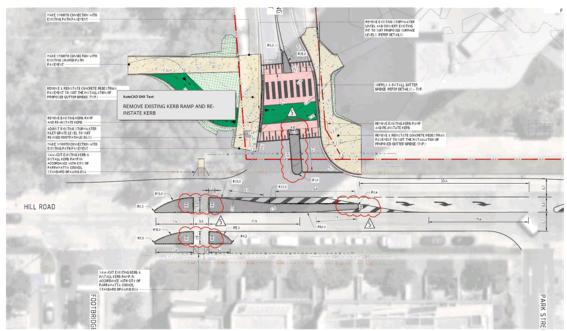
Plan showing the pedestrian refuge island and pedestrian crossings at the intersection of Hill Road and Wattlebird Road, Wentworth Point
